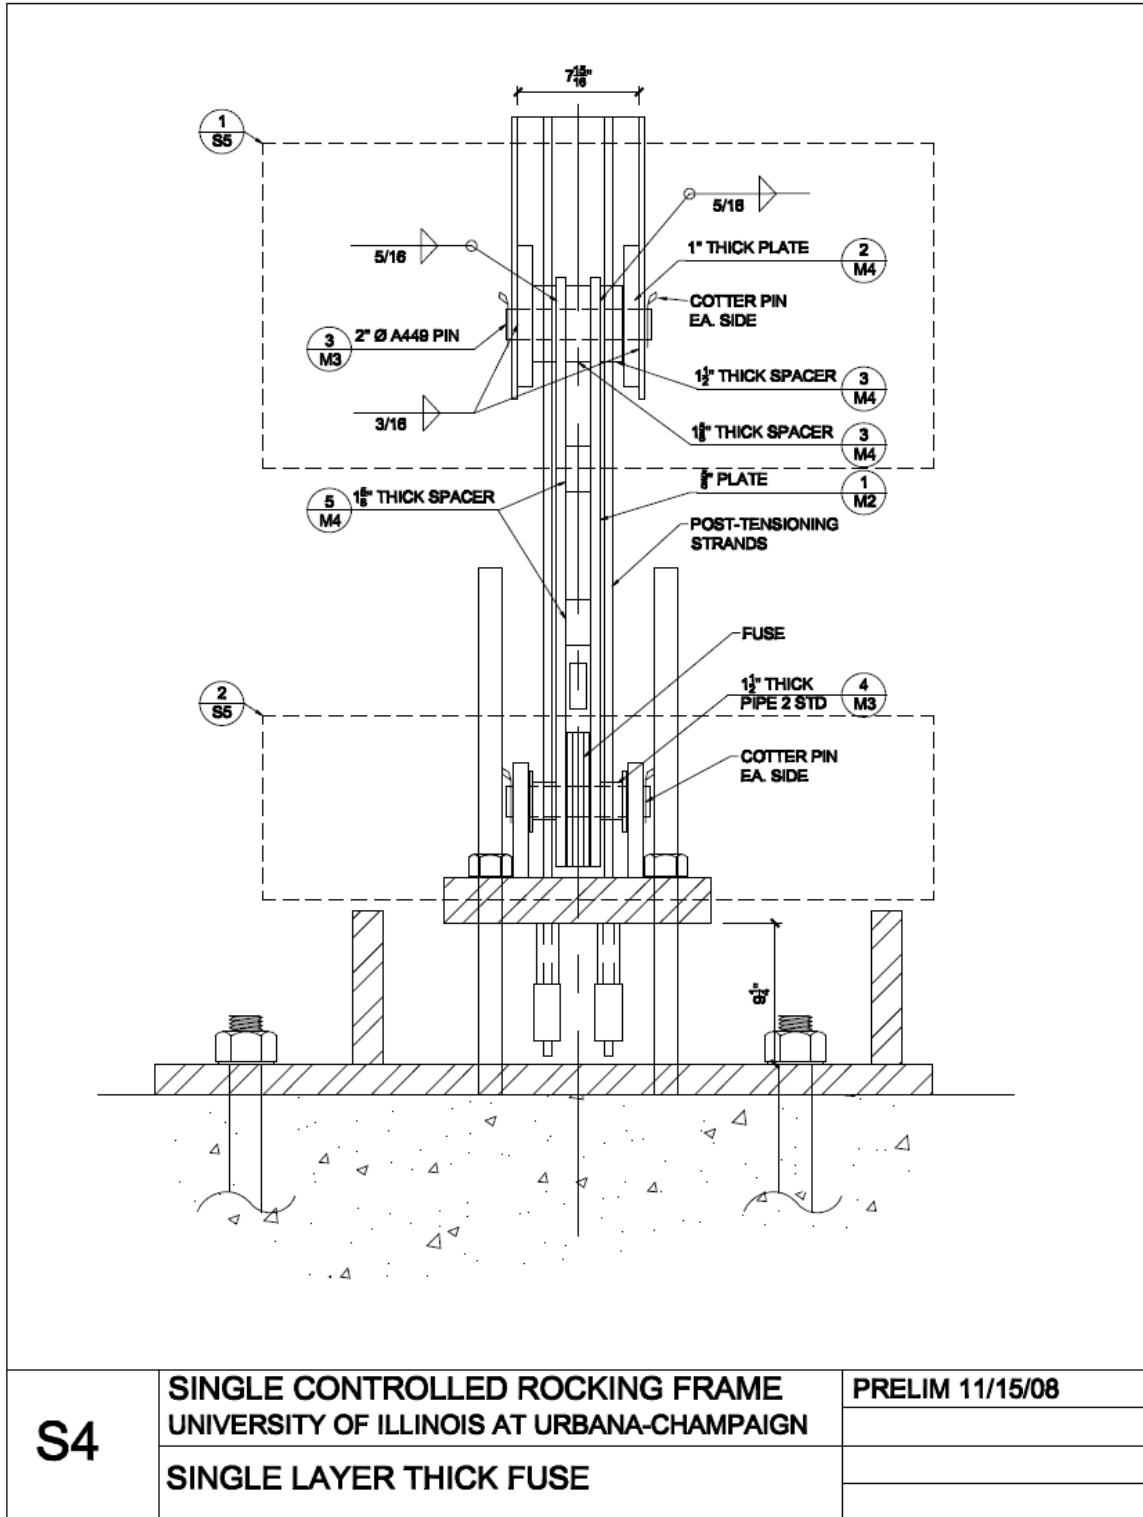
Design Drawing for the Single Frame Configuration – Specimen B1
